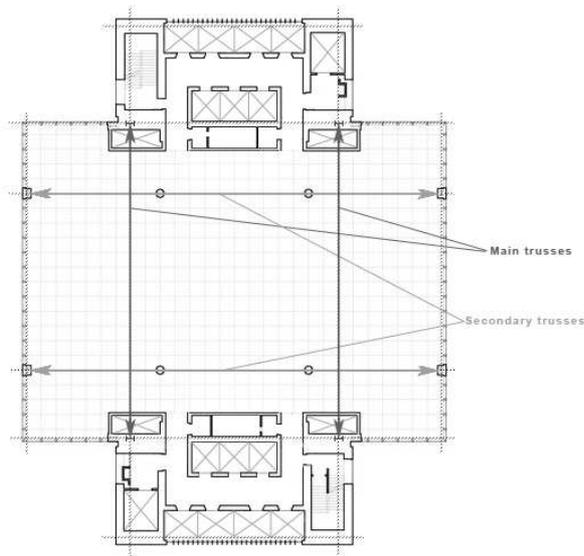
Standard Bankia Tower floor plan with the projection of the trusses.
